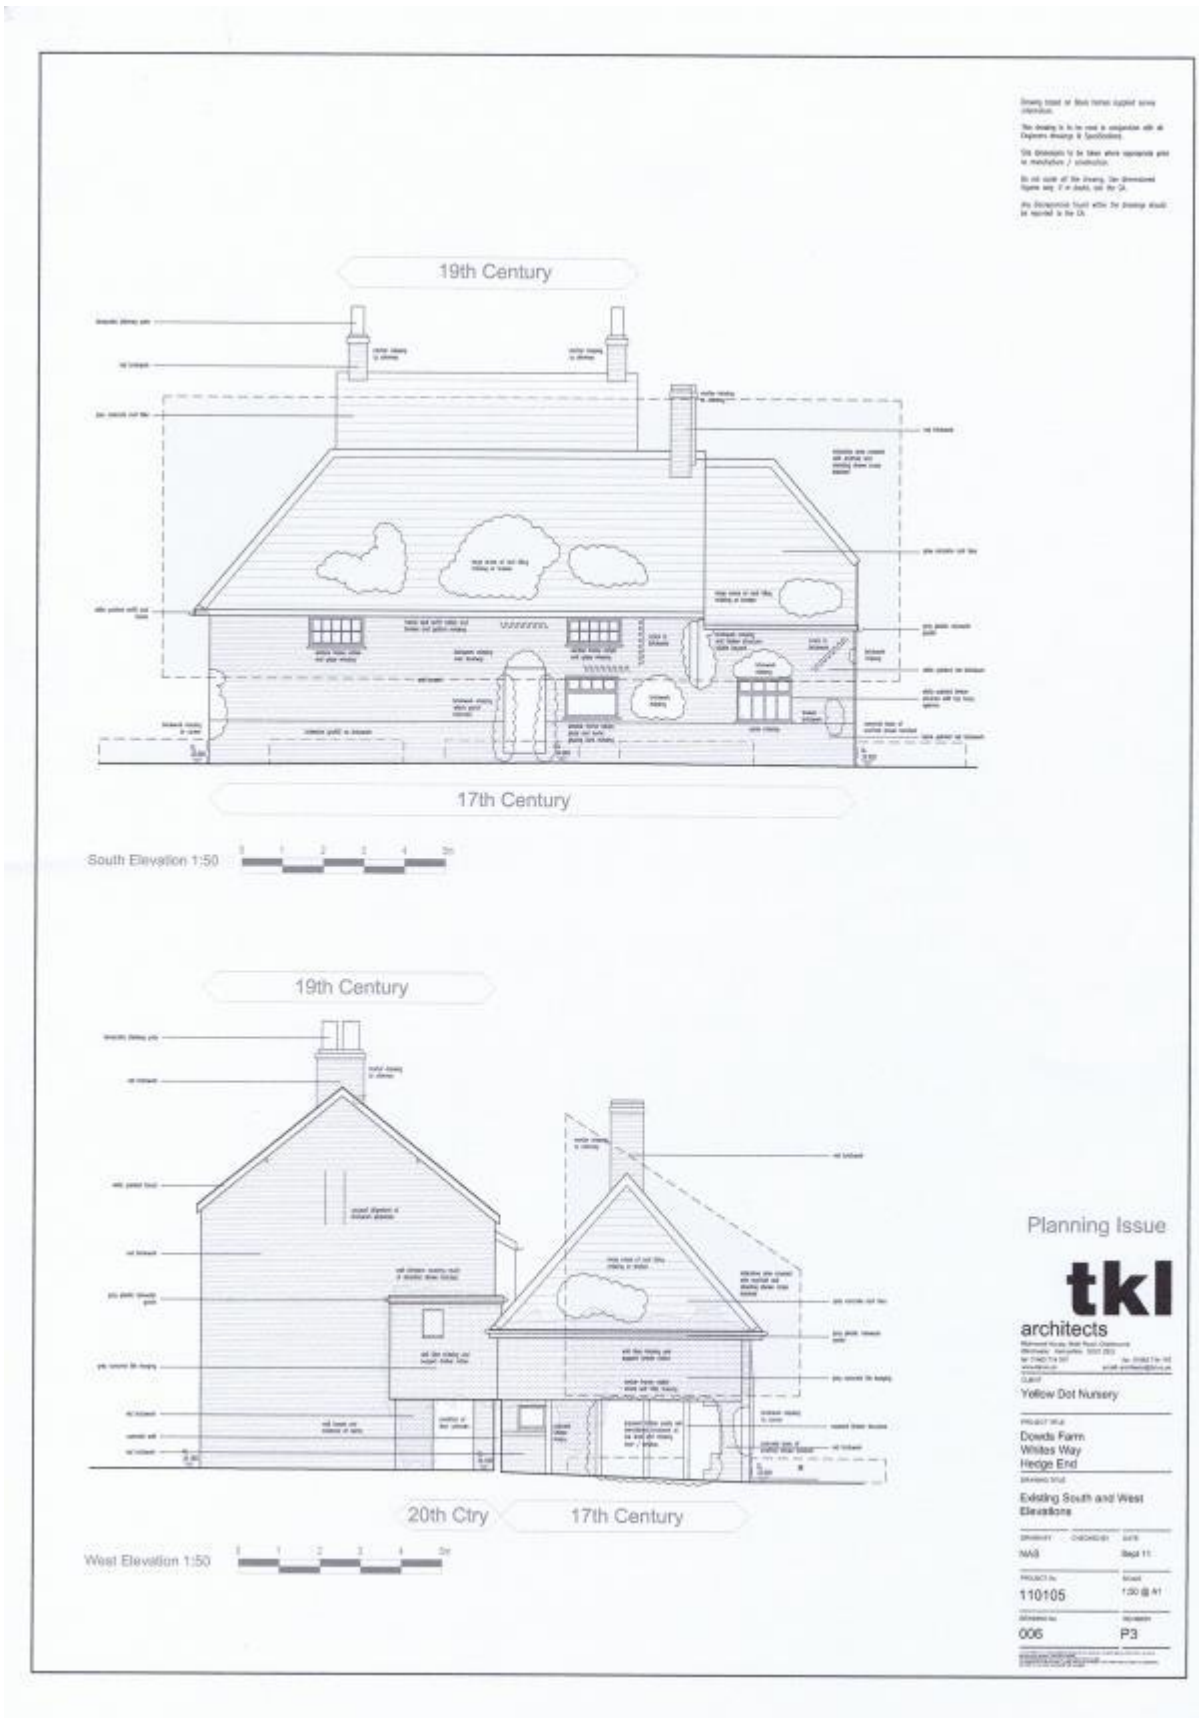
Dowd's Farm, Hedge End: Existing South and West elevations
